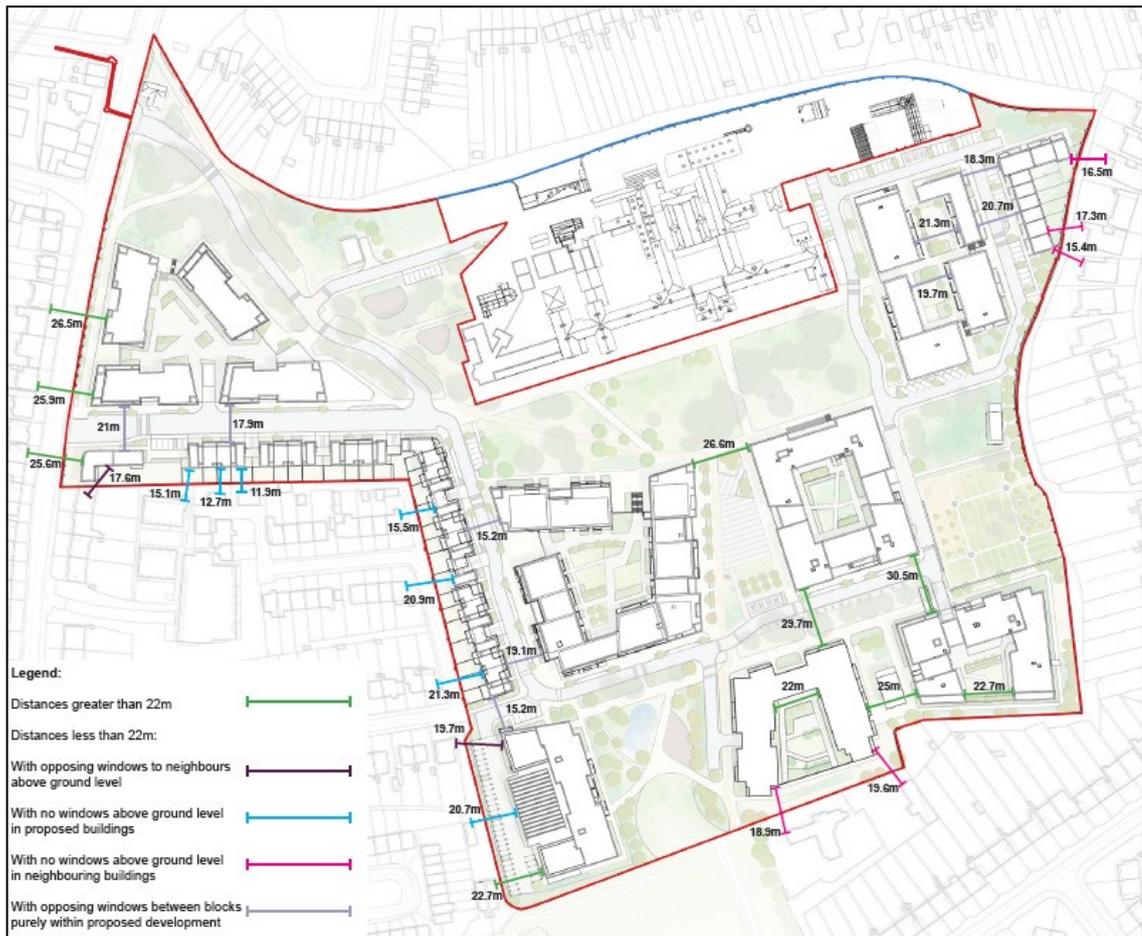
Illustrative site layout plan showing separation distances between the proposed buildings within the development and in respect of neighbouring buildings.
